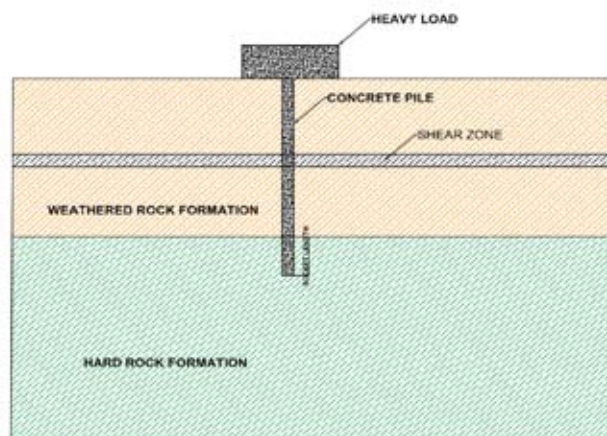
Typical section (not in scale) of pile embedded in rock-rock formation with shear zone
